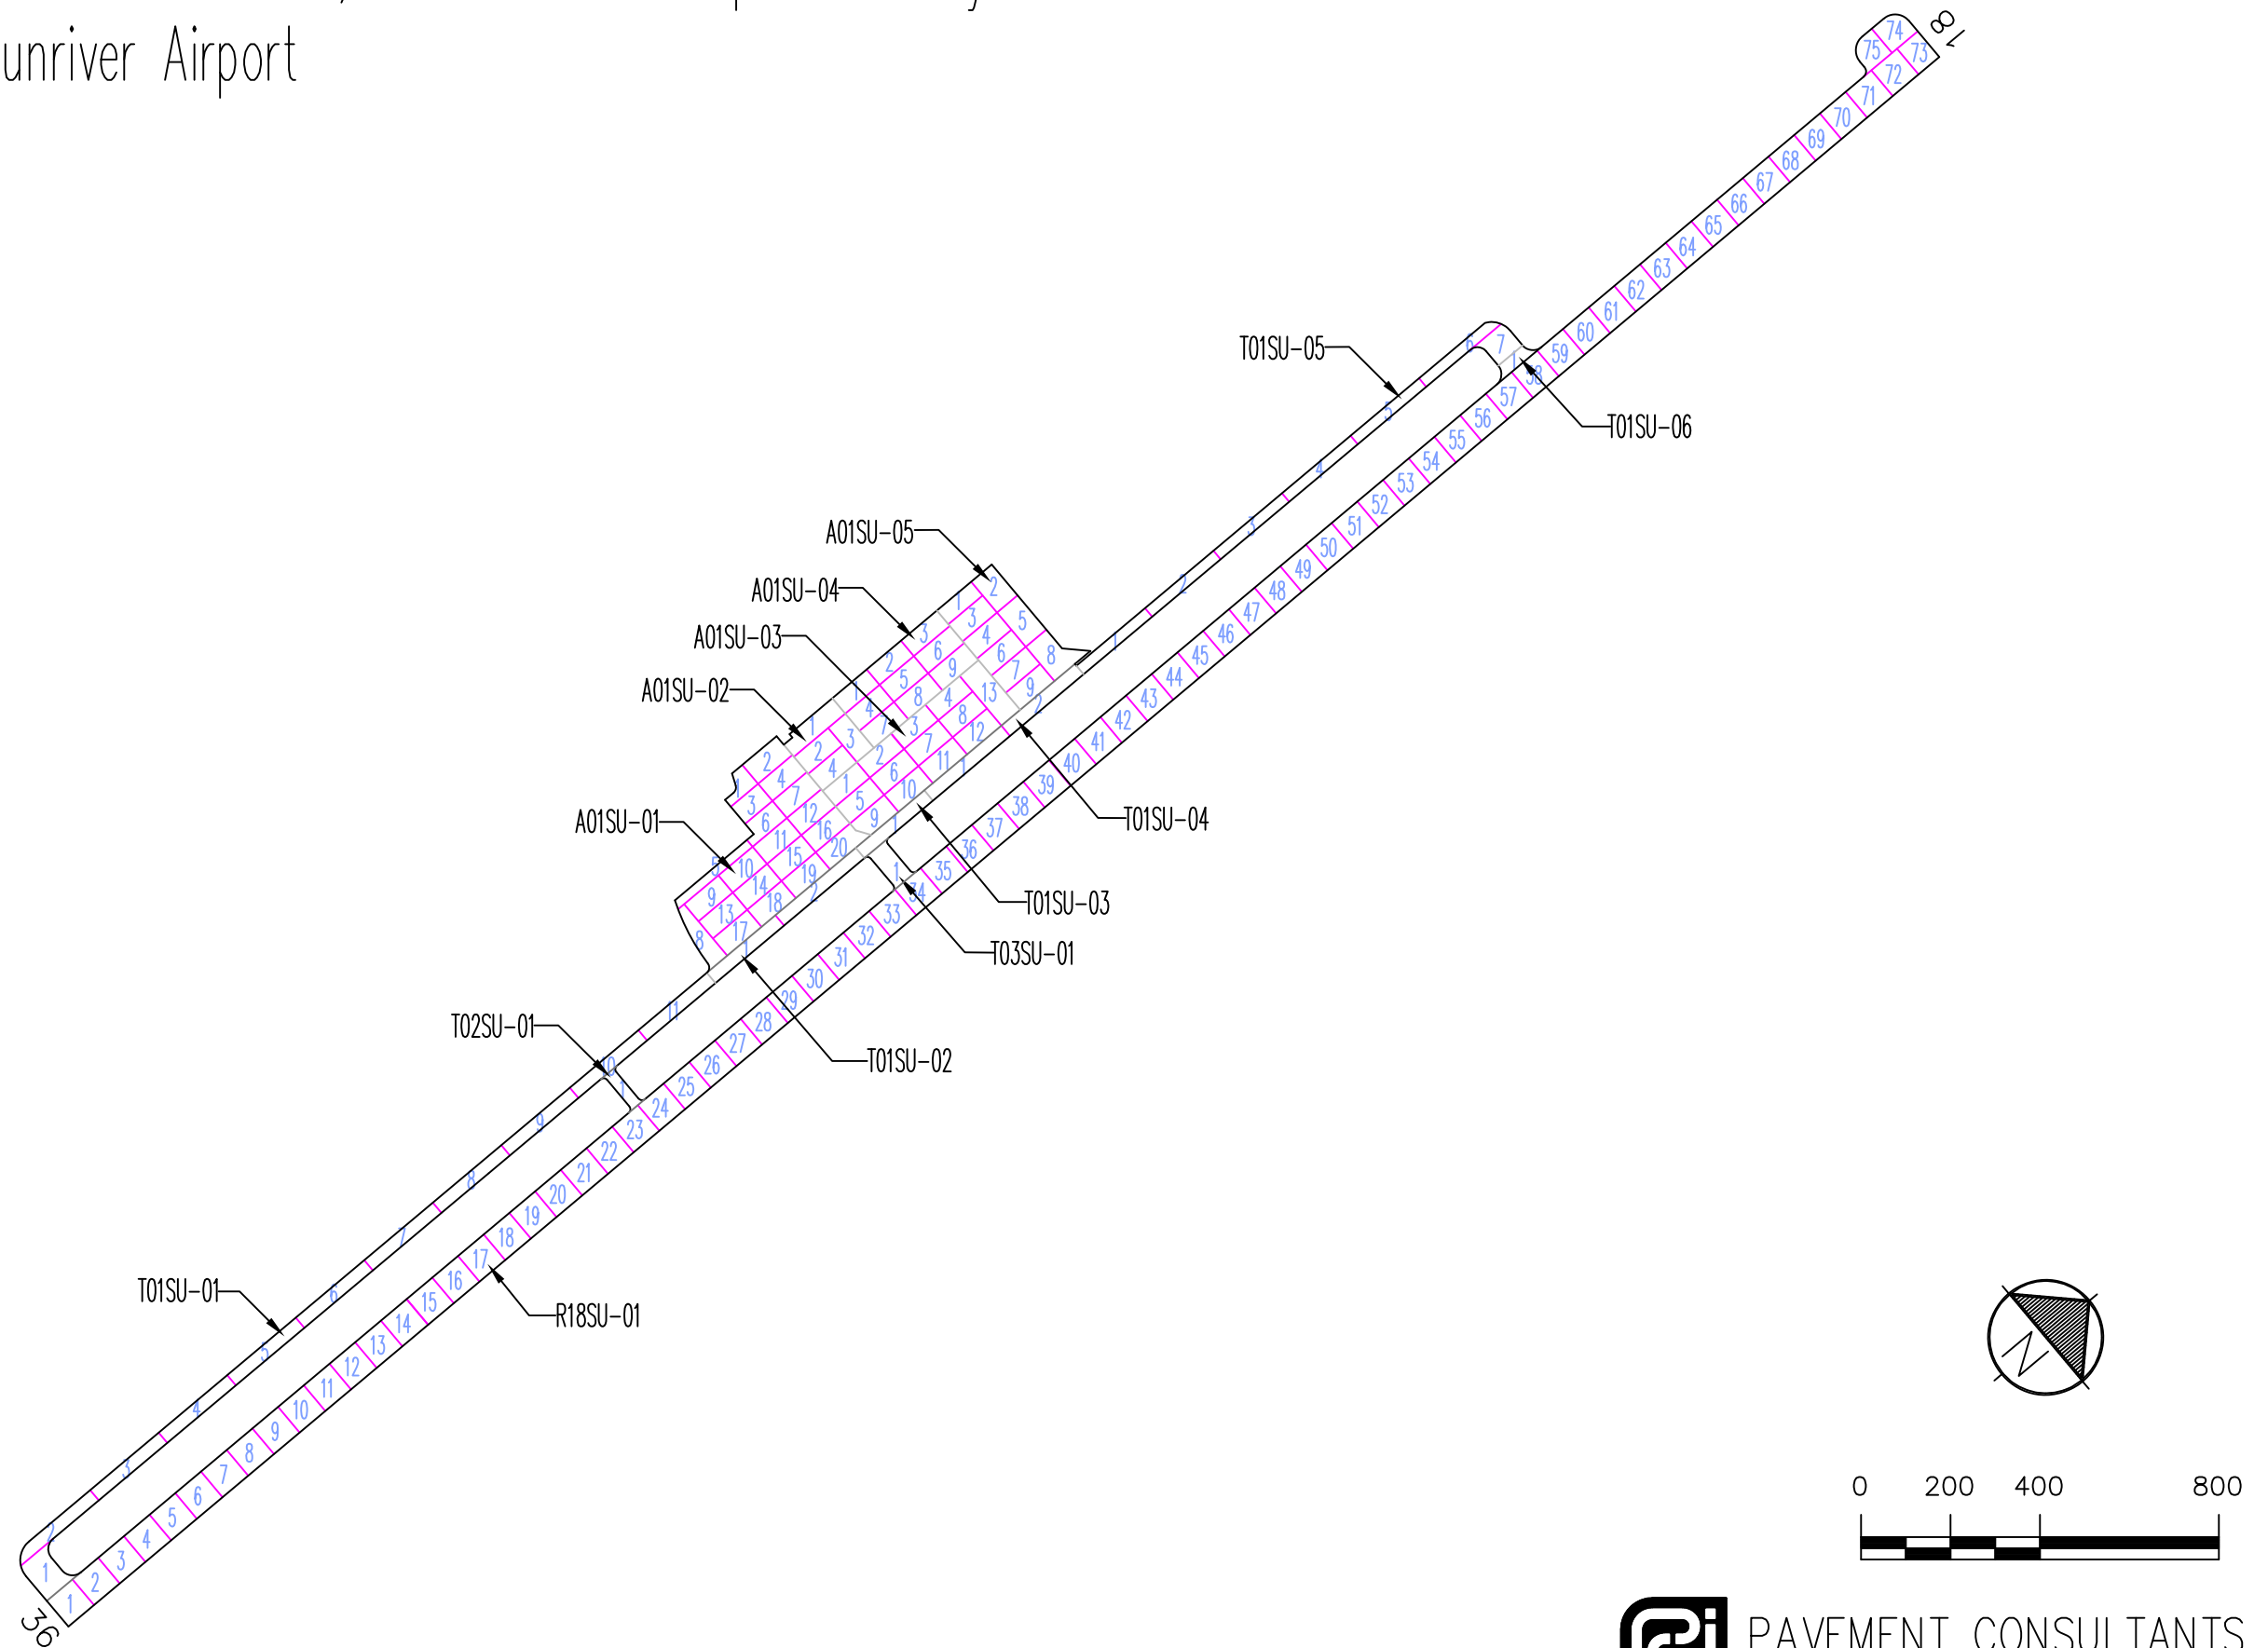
Pavement Branch, Section and Sample Unit Layout.
